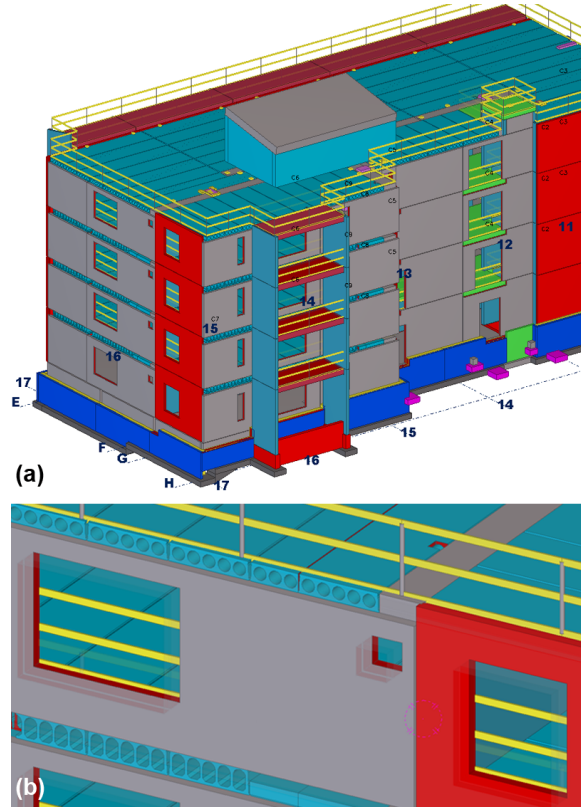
Protective fall protection systems in Section C of the building (left) and close view of wall opening protection (right).
